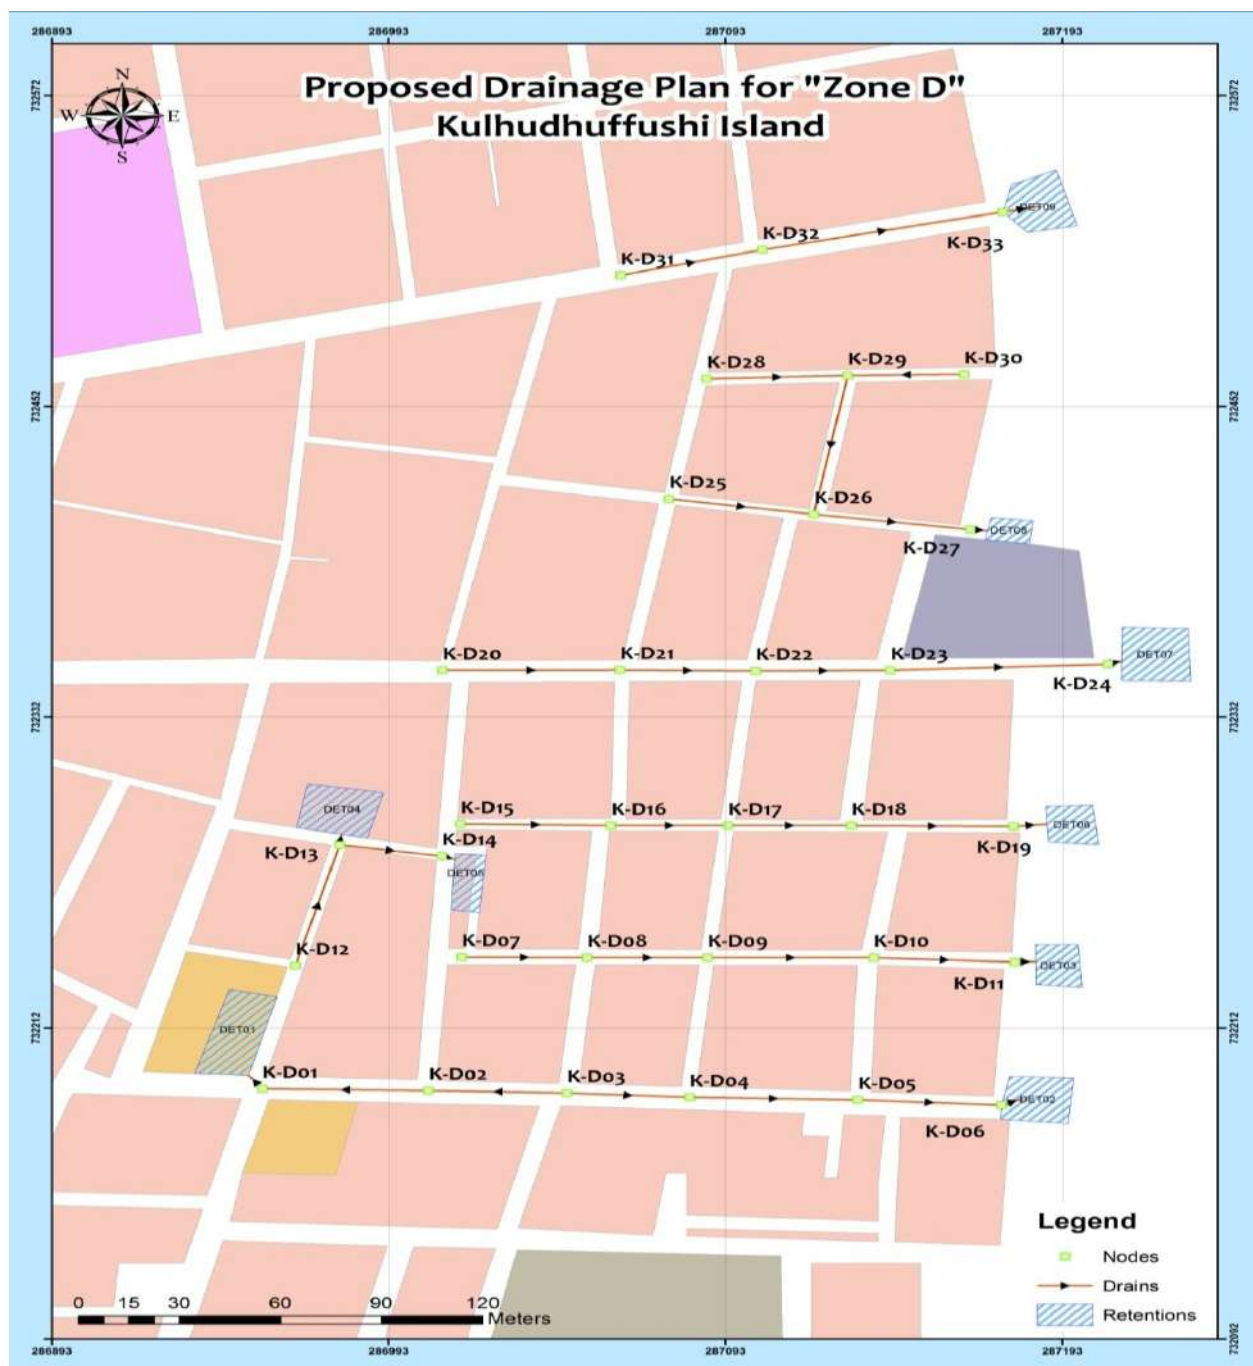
out Drainage plan Zone D Hdh. Kulhudhuffushi Island
